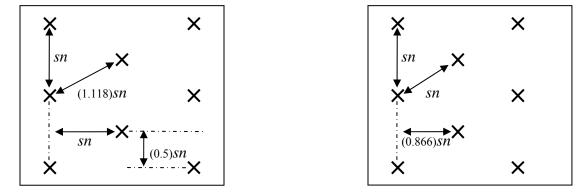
Adjusting of Columns Spacing in Vicinity of Shortened Columns
